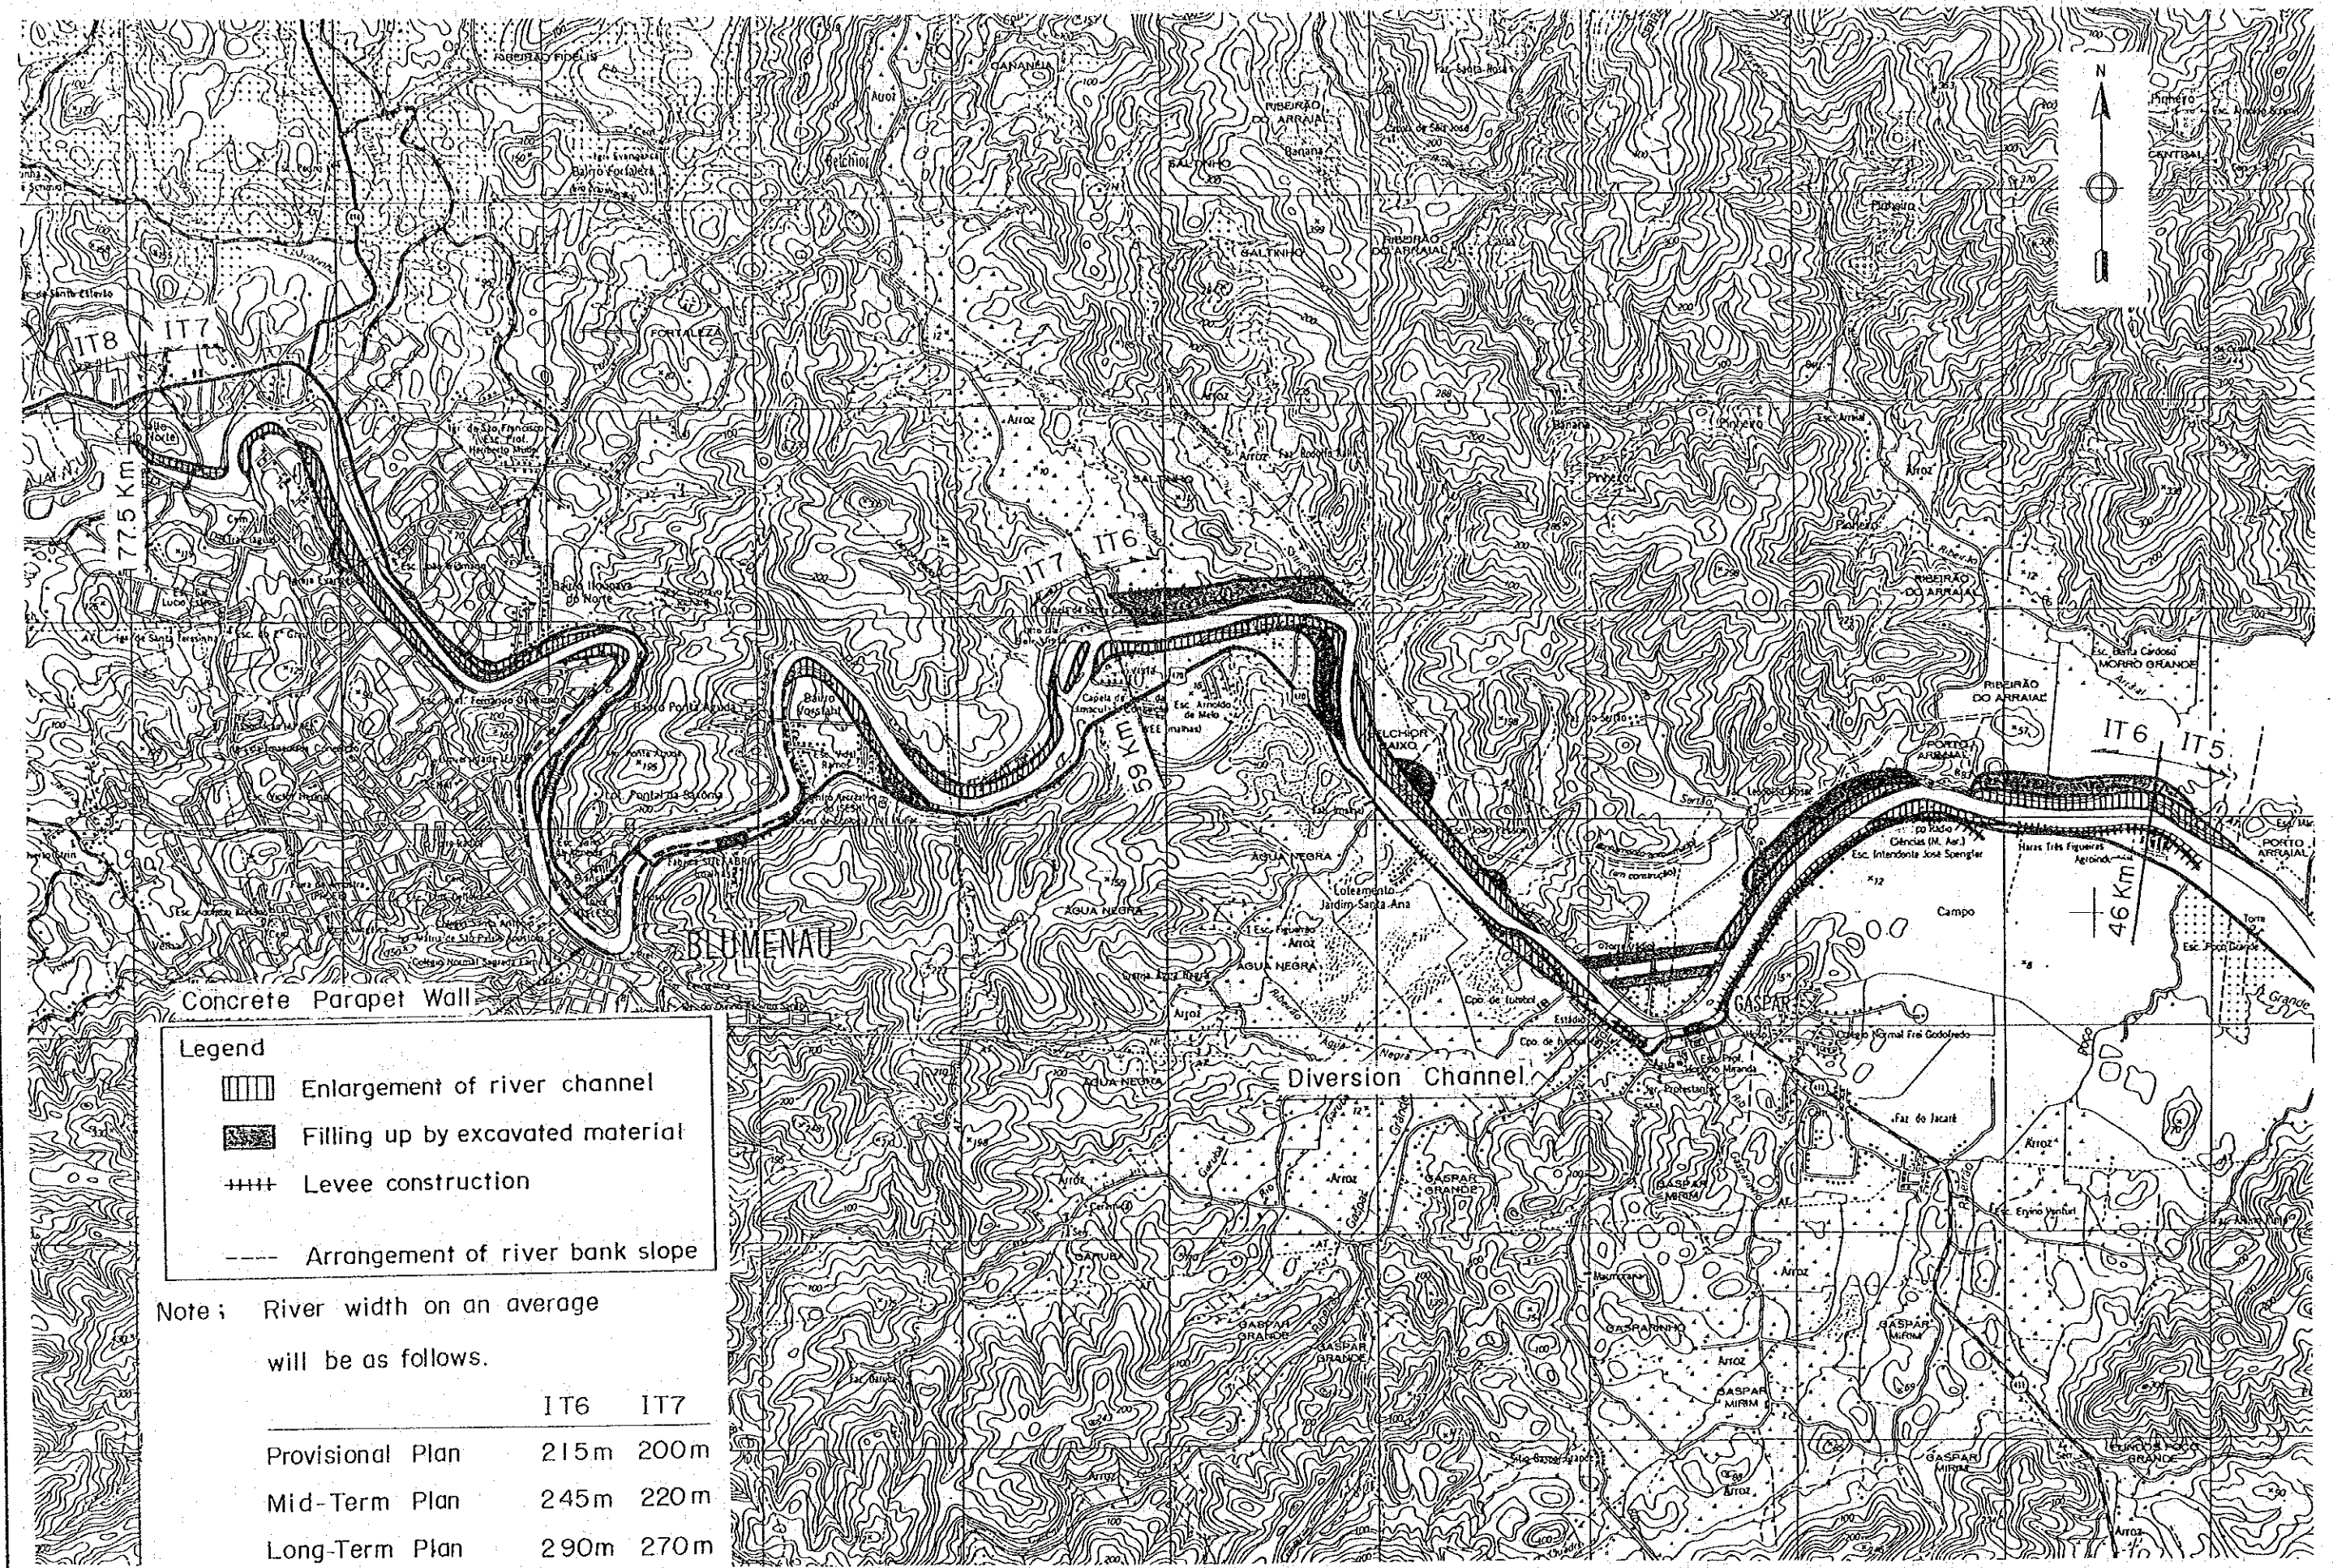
RIVER IMPROVEMENT PLAN IN BLUMENAU-GASPAR STRETCH
